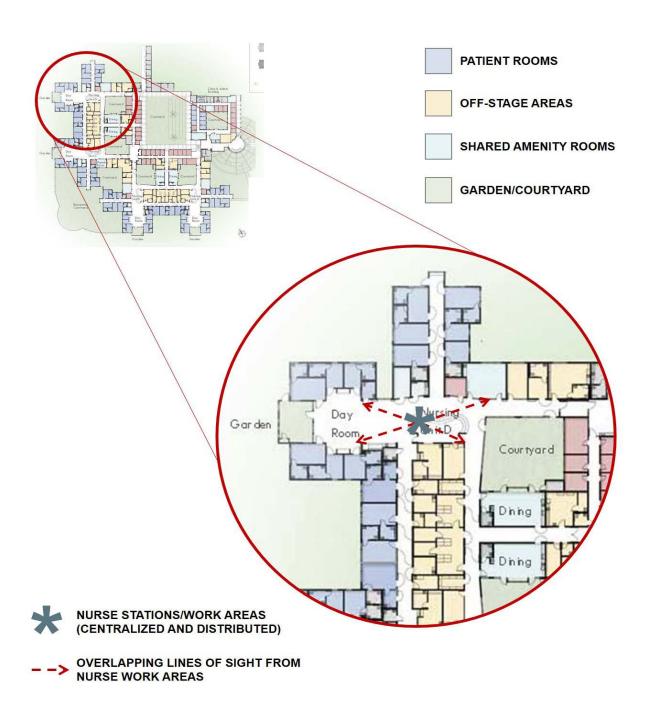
VAMC Palo Alto planning and design distributes accessible courtyards and gardens throughout the single-level facility. Patient Bedroom pods are organized around shared courtyards, gardens and Day Rooms to provide access to daylight throughout and to support interaction and a therapeutic environment. Patient pods are grouped around shared amenity areas including Dining Rooms, Group Rooms and Consult Rooms.
